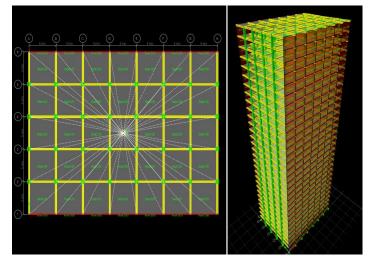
Extrude plan and 3D-view of shear wall structure (X-direction)
